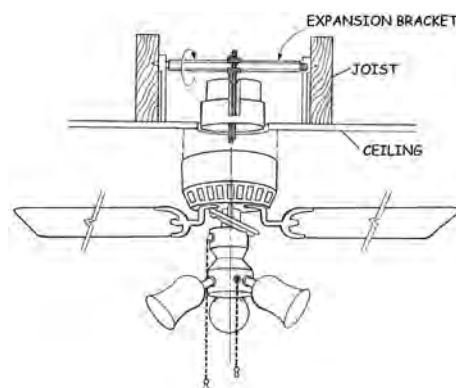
CEILING FAN MOUNTING WITH EXPANSION BRACKET
